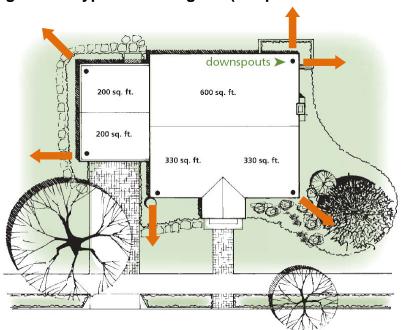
Typical Lot Diagram (Adapted From Portland, 2008)
